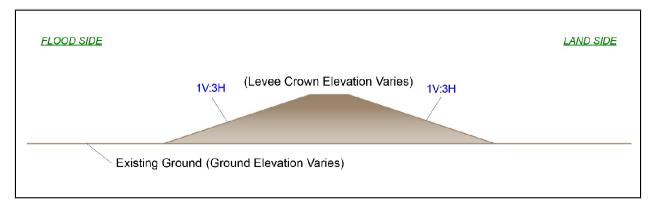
Typical Cross-section for South Slidell Levee for Future Lifts
